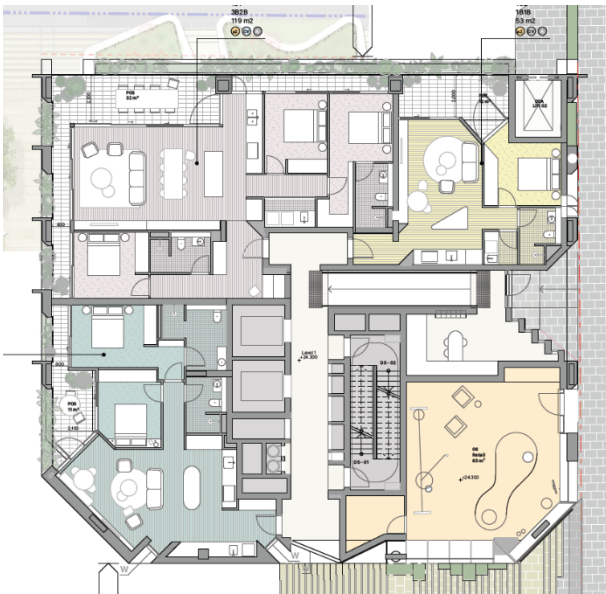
Lodged Façade and Apartment Layout (Level 03)
